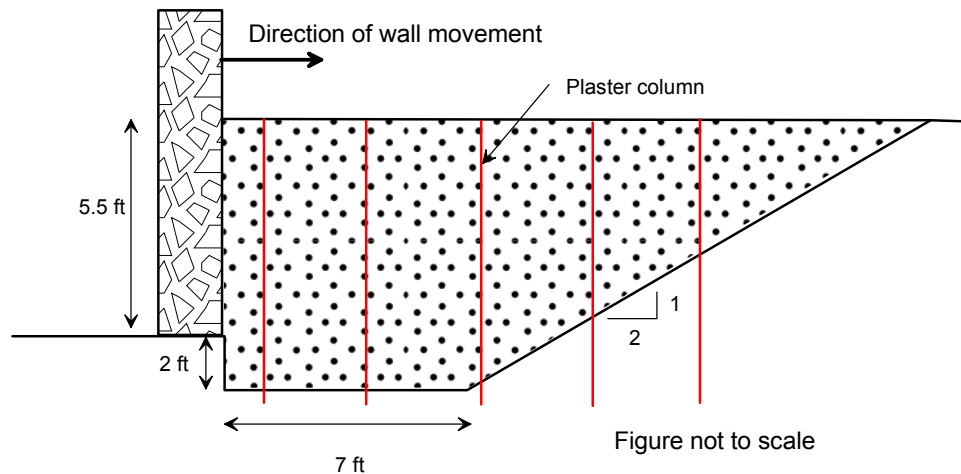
Schematic cross section through test specimen illustrating the shape of the excavated surface and backfill
